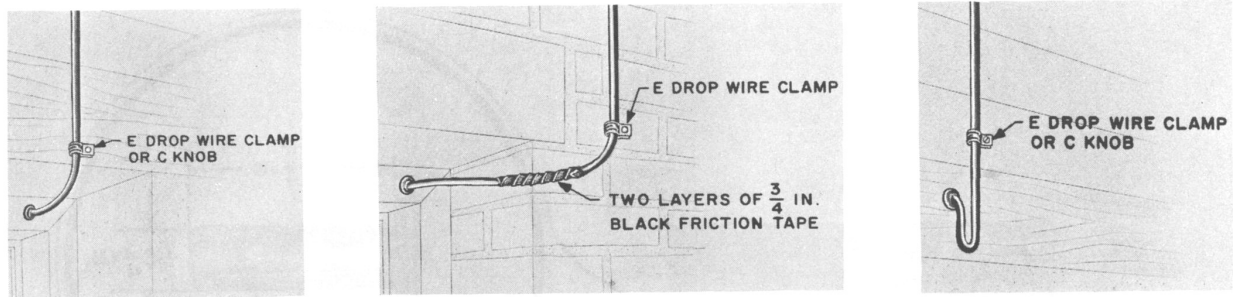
Last Attachment, Building Entrance Slopes Upward from Outside
